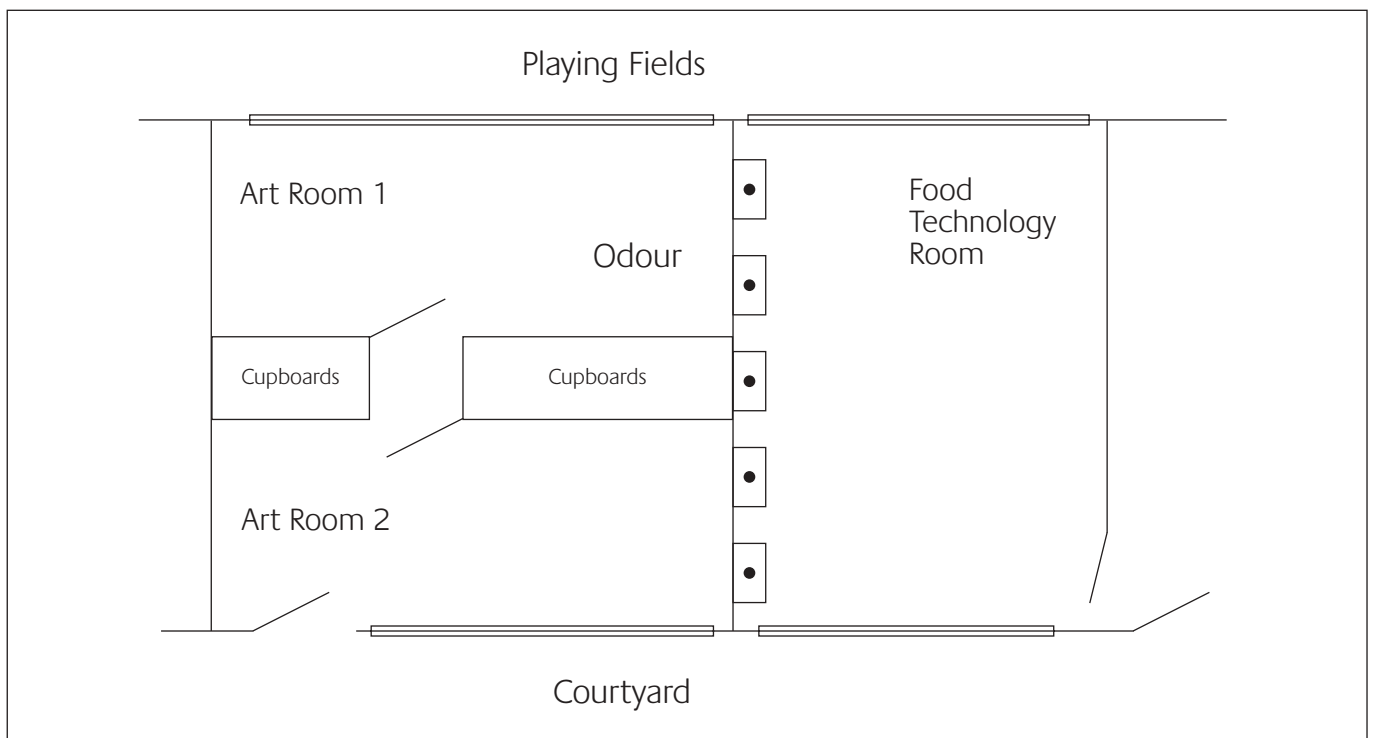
Floor plan of Art Room 1 (AR1), Art Room 2 (AR2) and Food Technology Room (FTR)
